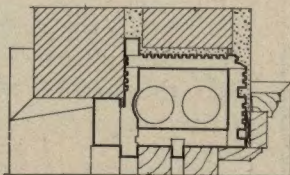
Narrow inside trim with 8-inch wall, same as Plate 6. Clinch grooves and extra rabbet in back of frame make it possible to bring plaster over to thin ground as shown.
